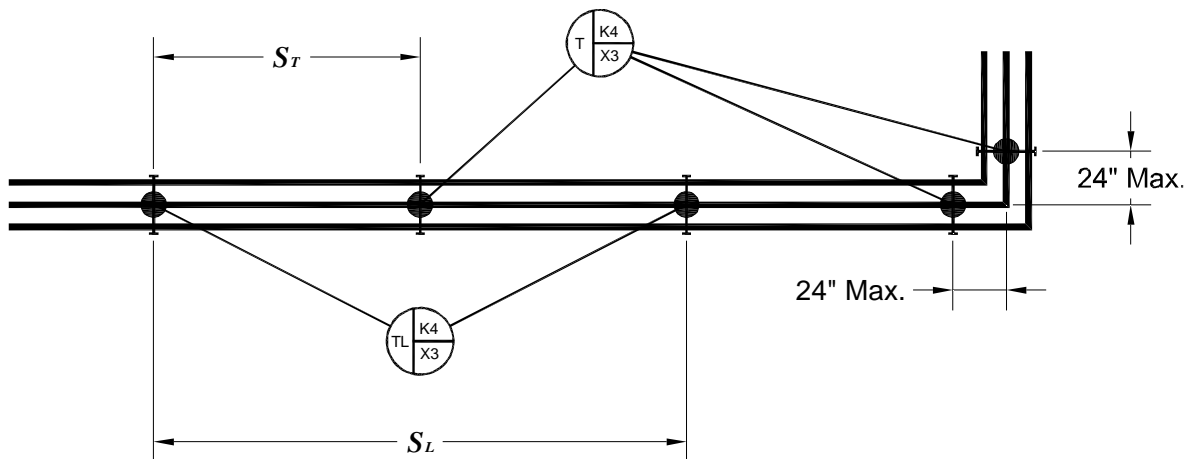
; Typical Kinetics Noise Control Seismic Restraint Kit and Anchorage Kit, and Location Callouts for Trapeze Supported Pipe
